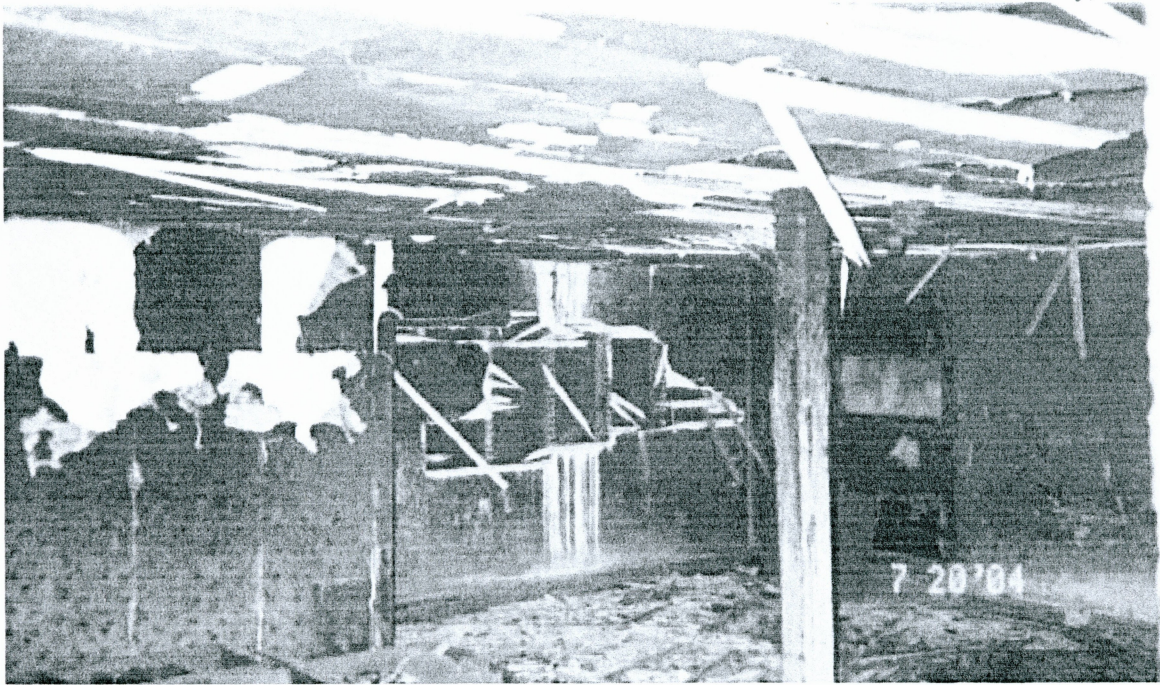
(First Level Front Dining Room - Typical Condition)
